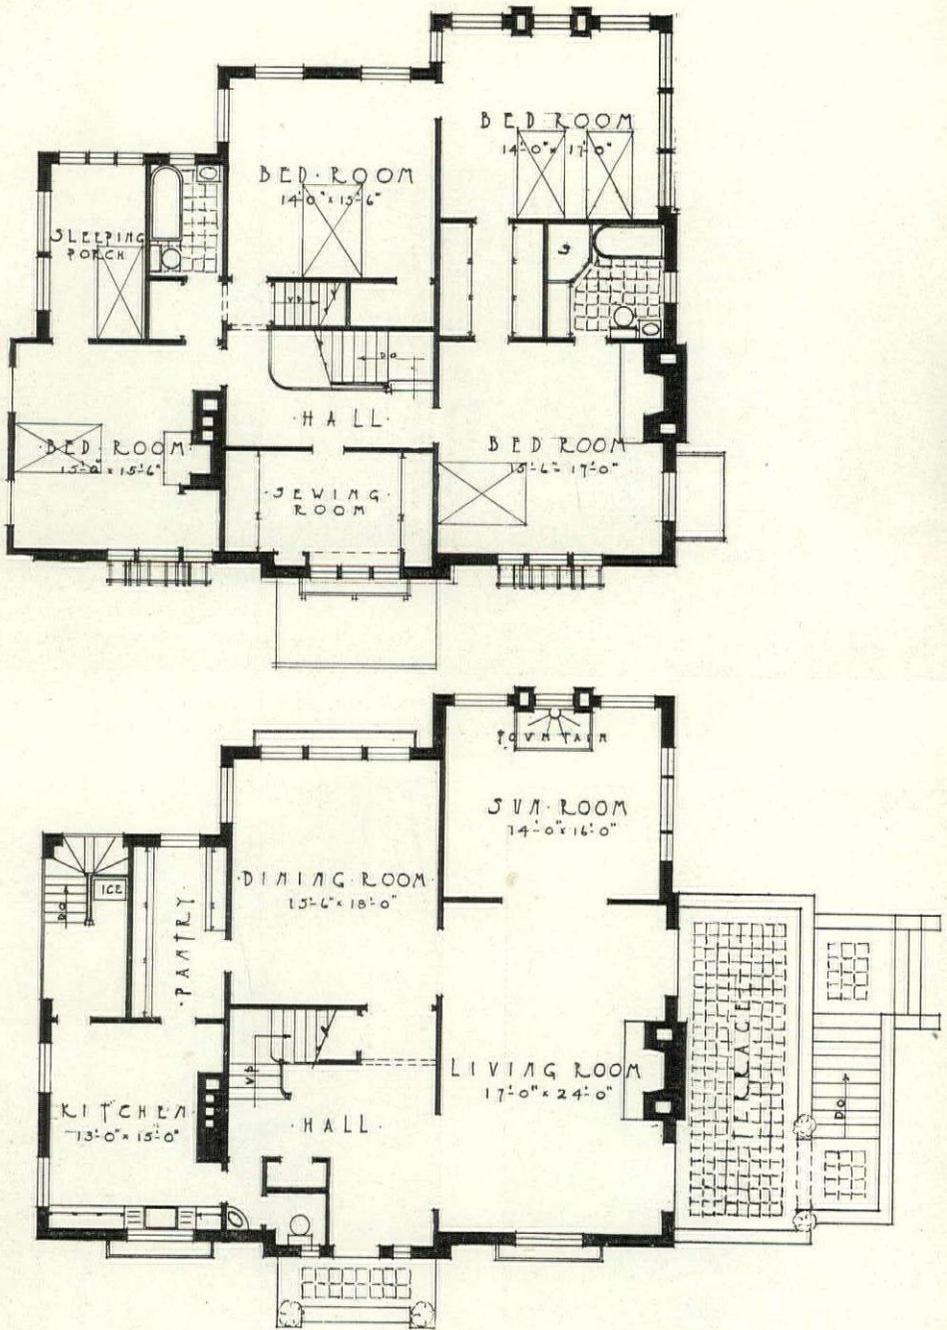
FIRST AND SECOND FLOOR PLANS—
